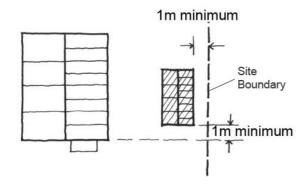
Detached outbuildings should be set back at least 1m from the front main building line of the main house and at least 1m from the site boundary.
